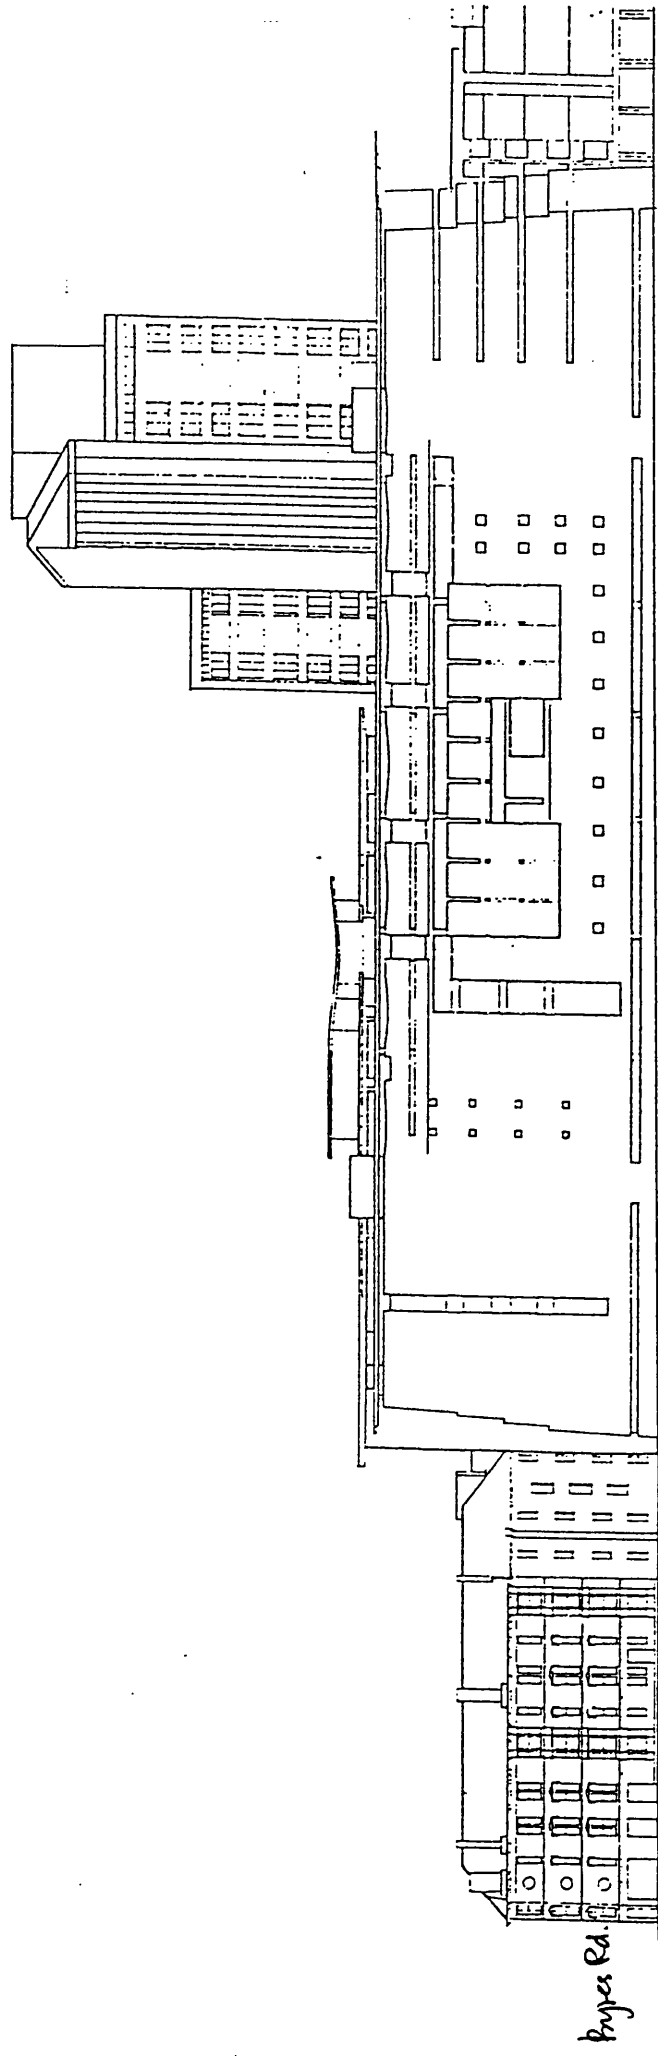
(c): SIDE ELEVATION FRONTING UNIVERSITY PLACE
